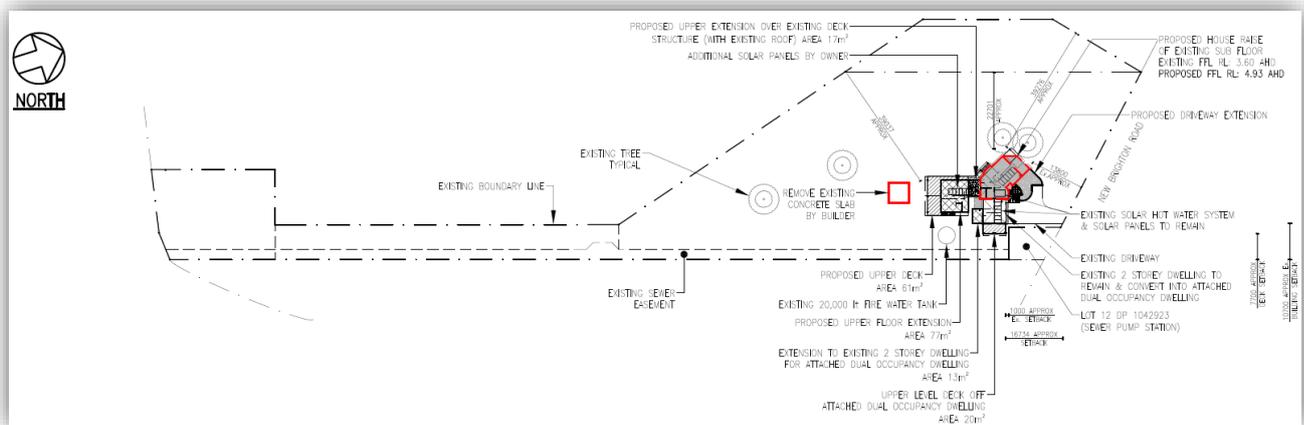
Site Plan LB_DA ISSUE 14.08.2023 (Source: Lutz Bendig)
